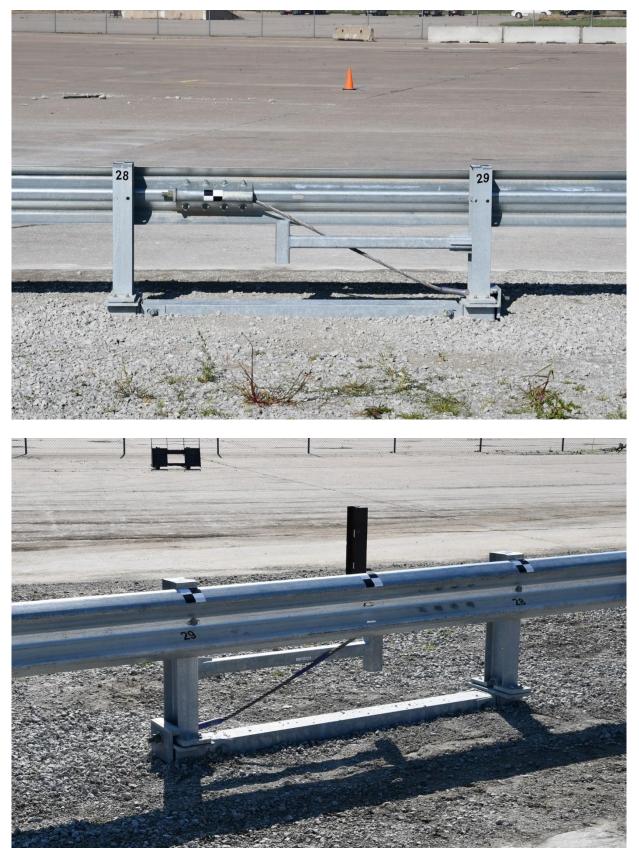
Test Installation Photographs – Trailing-End Anchorage System, Test No. SPTA-1
